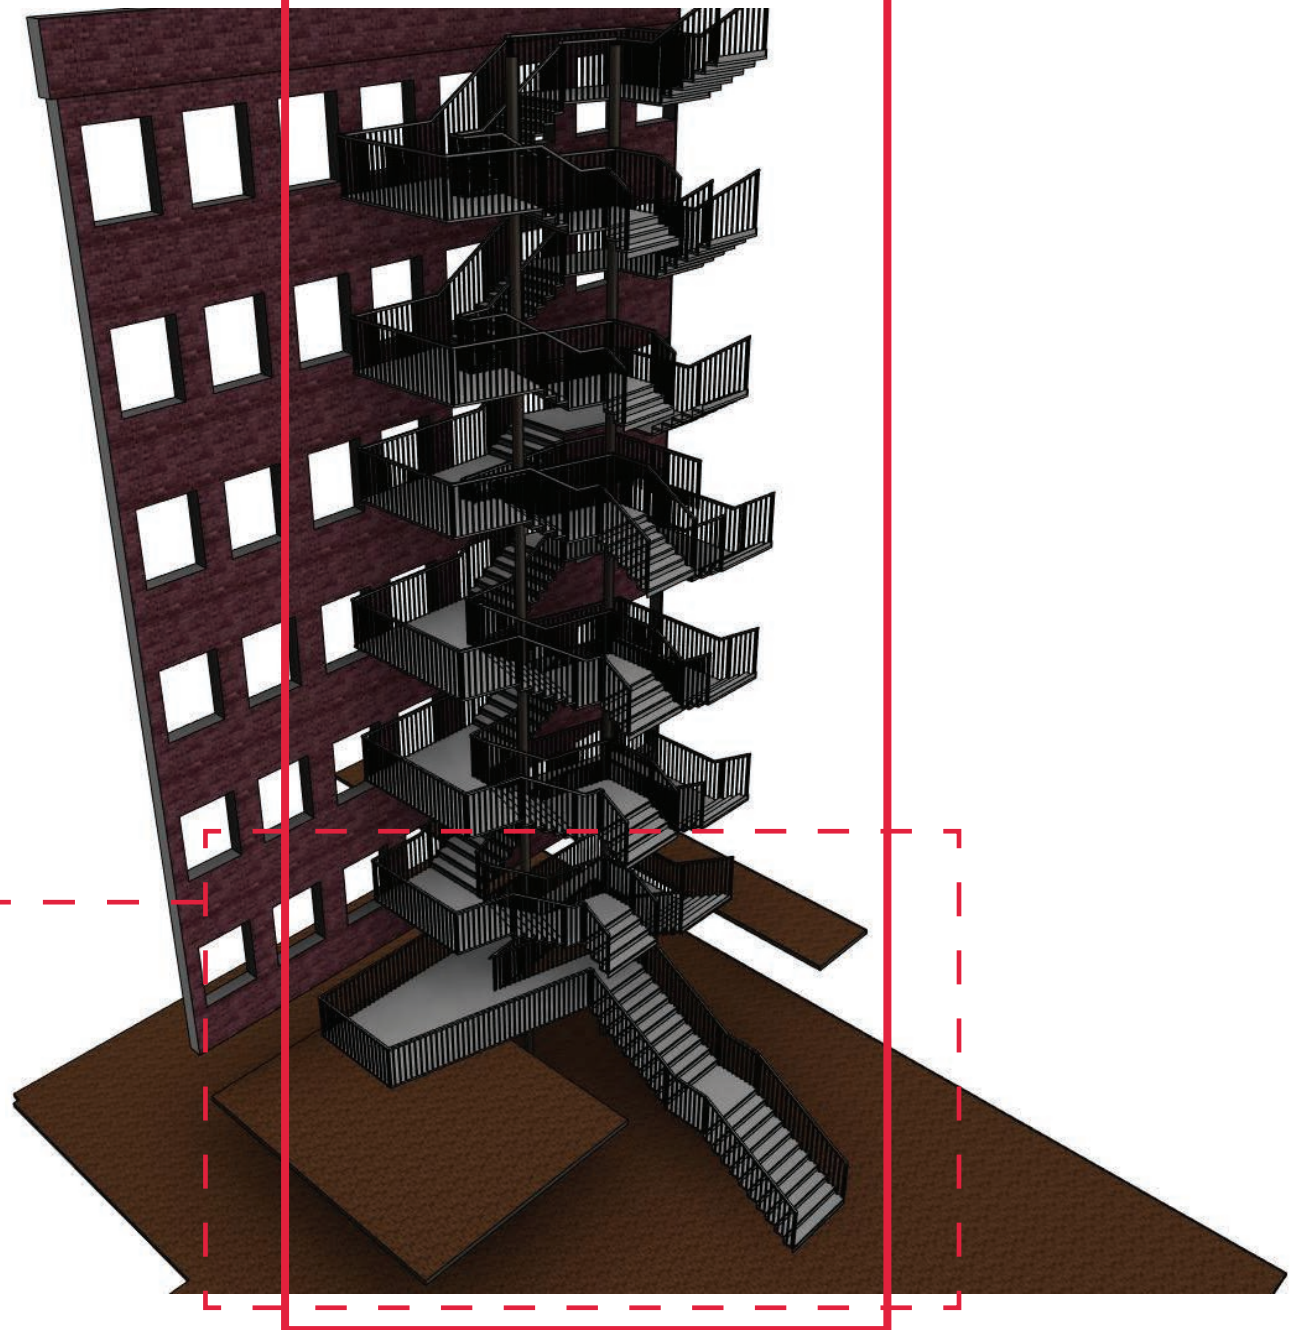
Axonometric and plan view of design draft 1 of the staircase design (August 2019)
